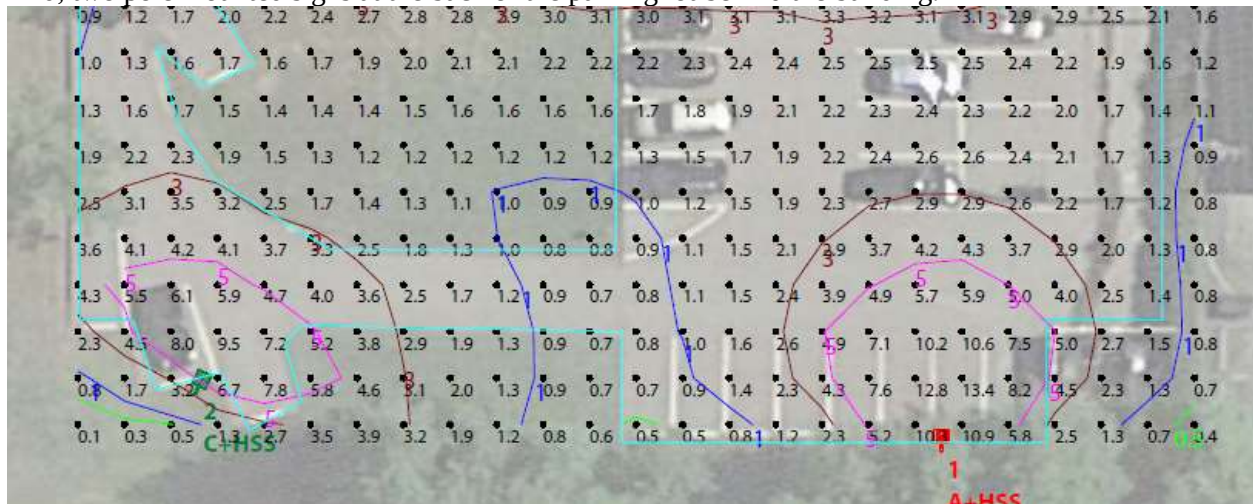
Close-up of the Site Photometric Plan, showing the location of the two pole mounted light fixtures.
